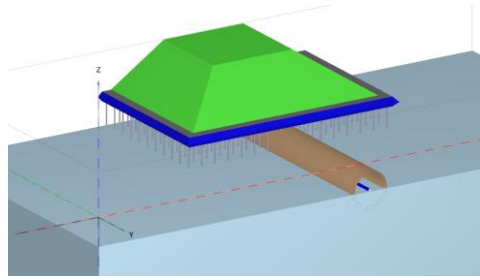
Full model of PVD vacuum preloading and existing underground pipeline
